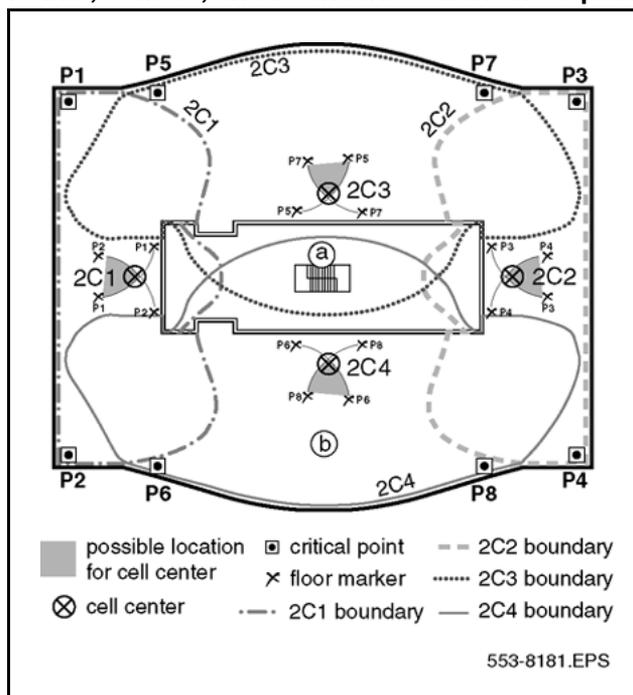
"Points, centers, and boundaries on the floor plan" (page 42) shows a typical floor plan marked-up after determining subsequent cell boundaries. The completed floor plan is as follows.
